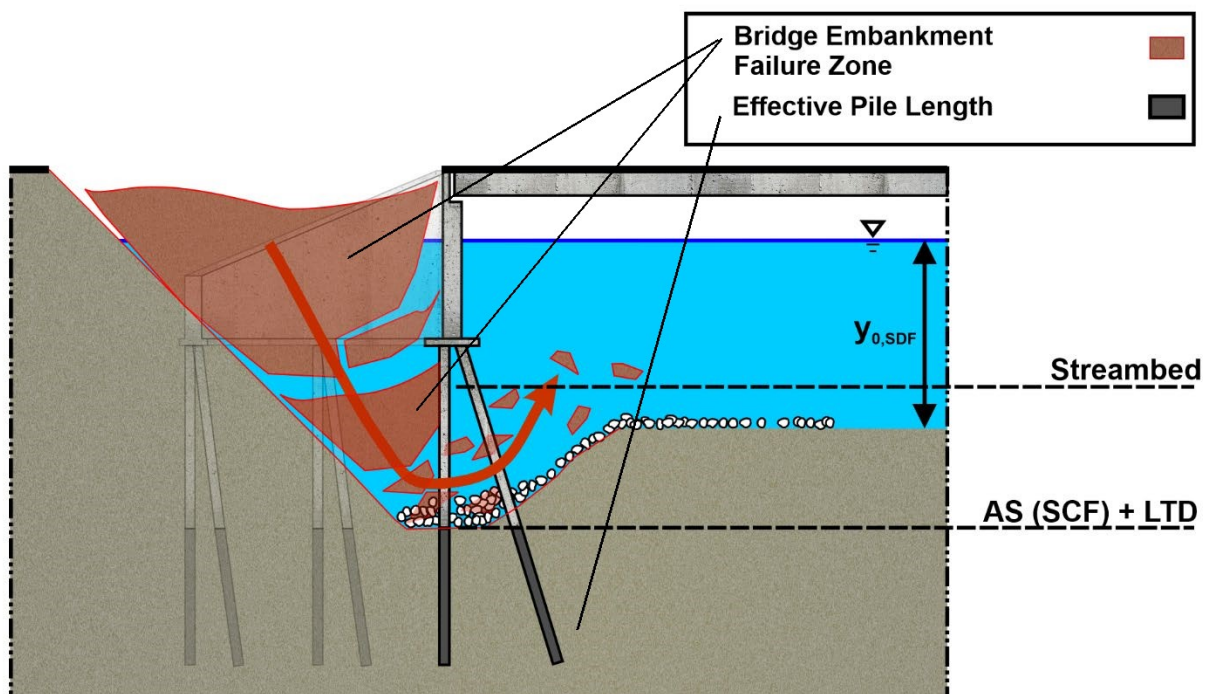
Bridge embankment countermeasure placed at owner-defined elevation failure during a flood event greater than owner-defined flood frequency.
